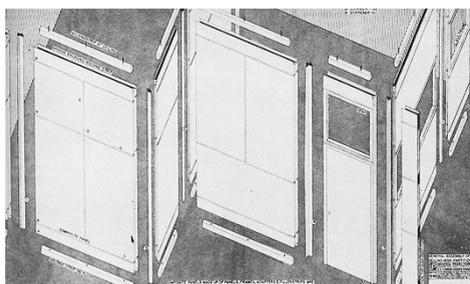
| Konrad Wachsmann, Prefabricated wooden panels (credit: Casabella, n. 244, 1960).
